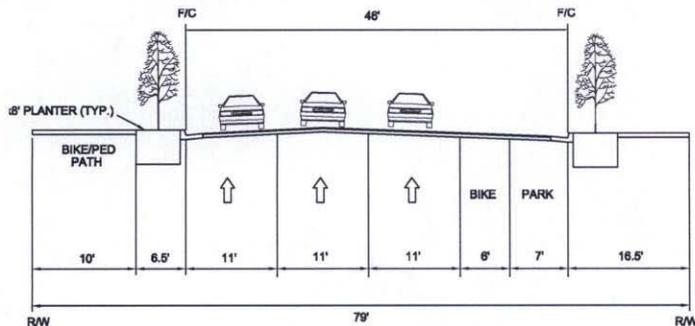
Railyards Boulevard - east of 7th Street (looking west)
